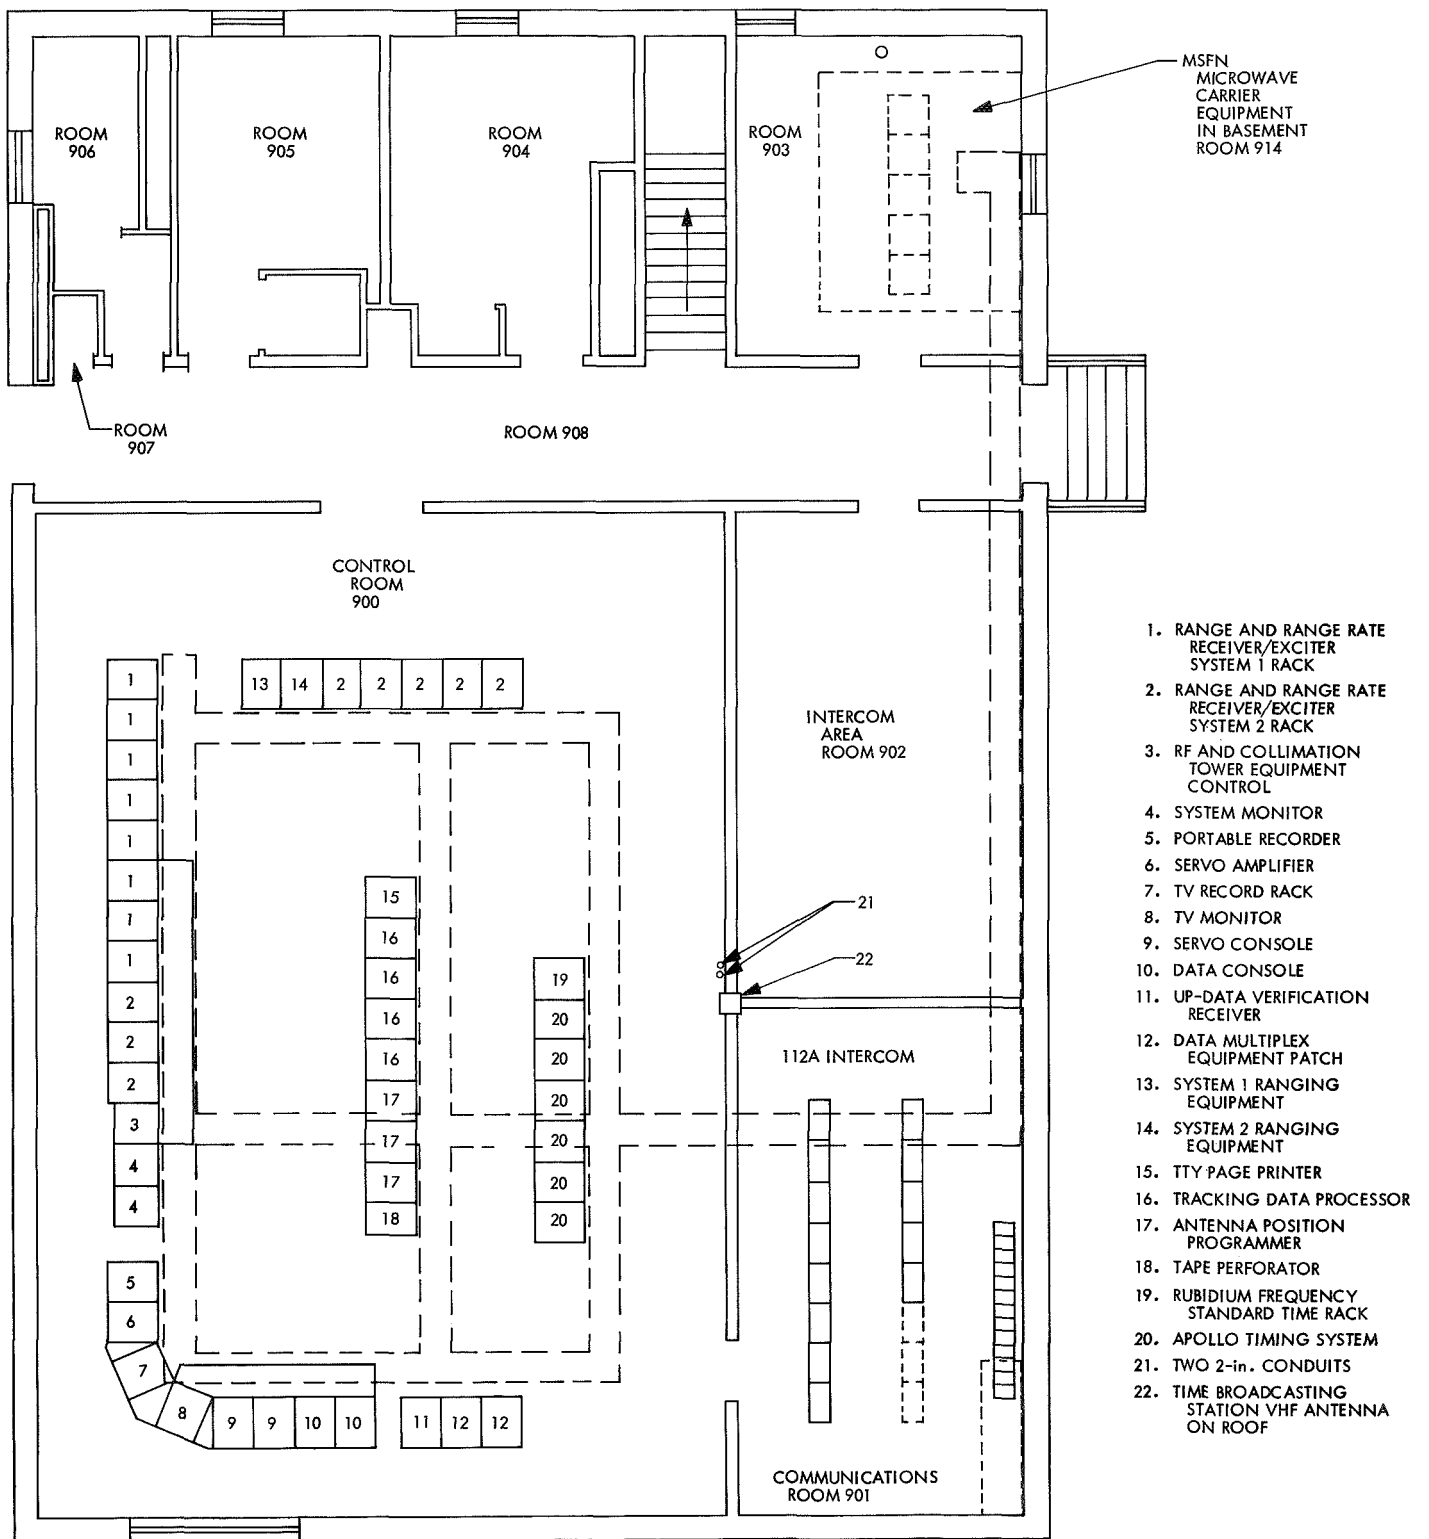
Manned Space Flight Network control room equipment layout at Robledo site
